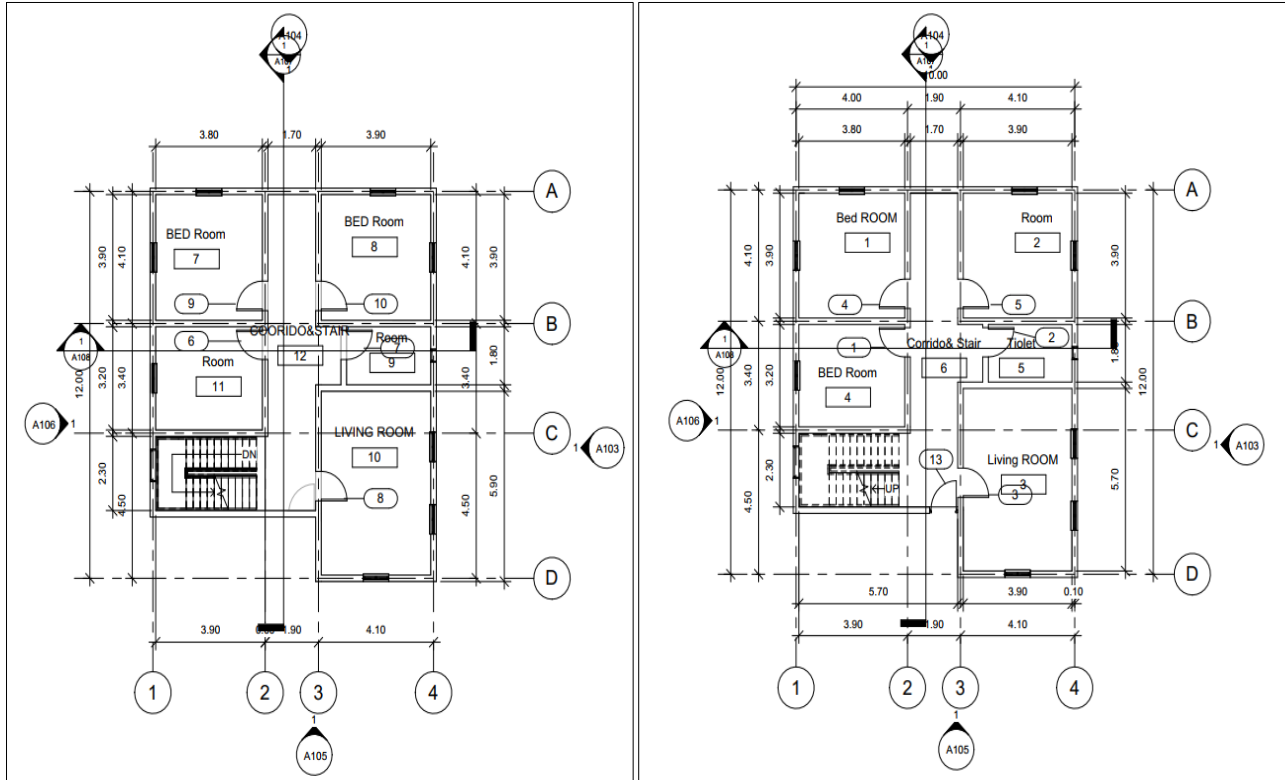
Floor plans of the case study building: (a) Ground floor plan; (b) 1st floor plan
